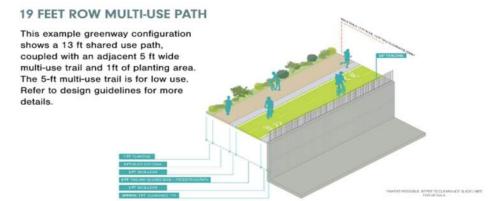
19-ft wide greenway cross section Option A example from Table 5-1
